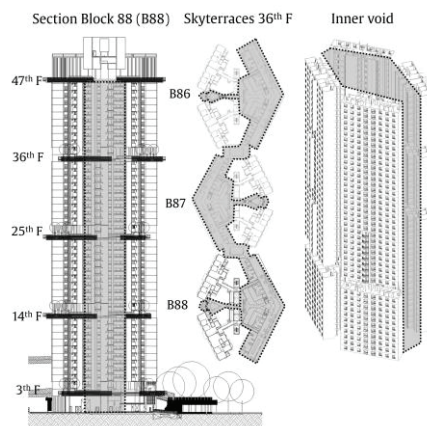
Building A showing section, floor plan with skyterraces and tower axonometric with inner void
